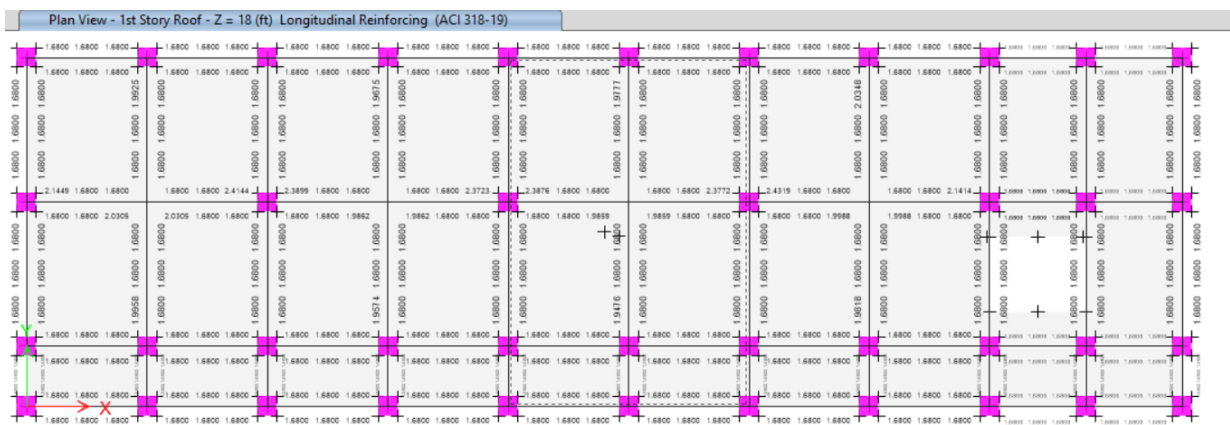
Longitudinal Reinforcement Area of 1st Floor Beam
